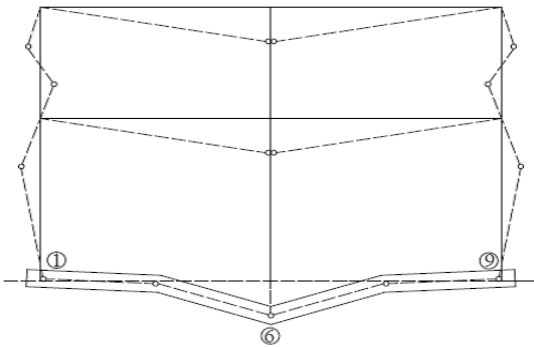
Two-storey structural frame founded on reinforced concrete strip foundation lying on the ground. The mechanism shown is one of the possible mechanisms of failure for the building frame and its foundation.
